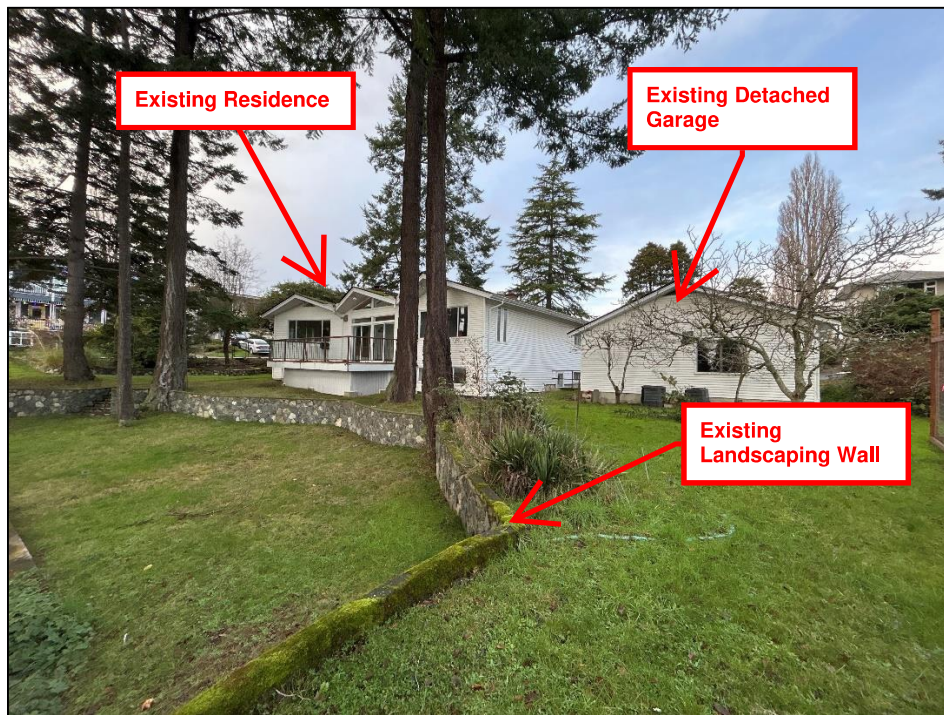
Showing Existing Residence and Detached Garage – Looking Northwest
